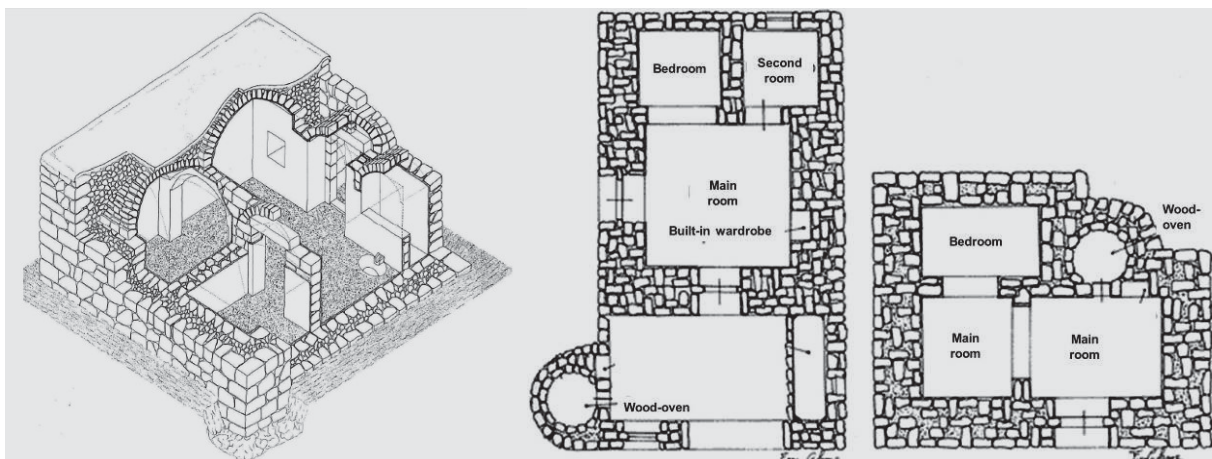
Section (left) and plans (right) of a typical *dammuso*-house.
